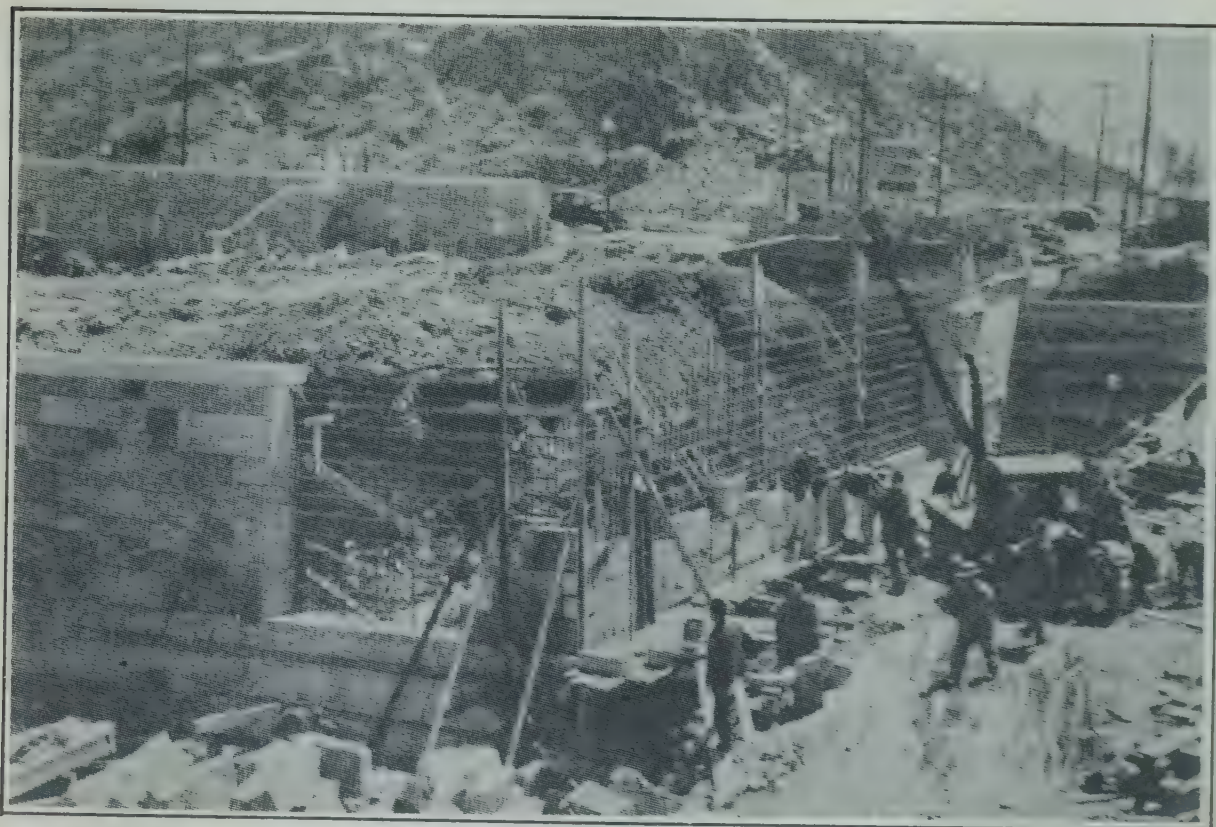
Construction of a stone-faced retaining wall, New Jersey plaza of the Lincoln Tunnel.
